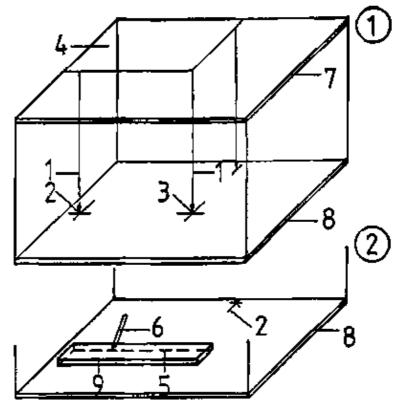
(1) Transferring of dimensions to the lower floor–ceiling (2) Connecting of marked points with the straightedge – 1 plumb cord, 2 marked point, 3 plumb body, 4 opening in the upper floor–ceiling, 5 applied straightedge, 6 pencil, 7 upper floor–ceiling, 8 lower floor–ceiling, 9 straightedge
